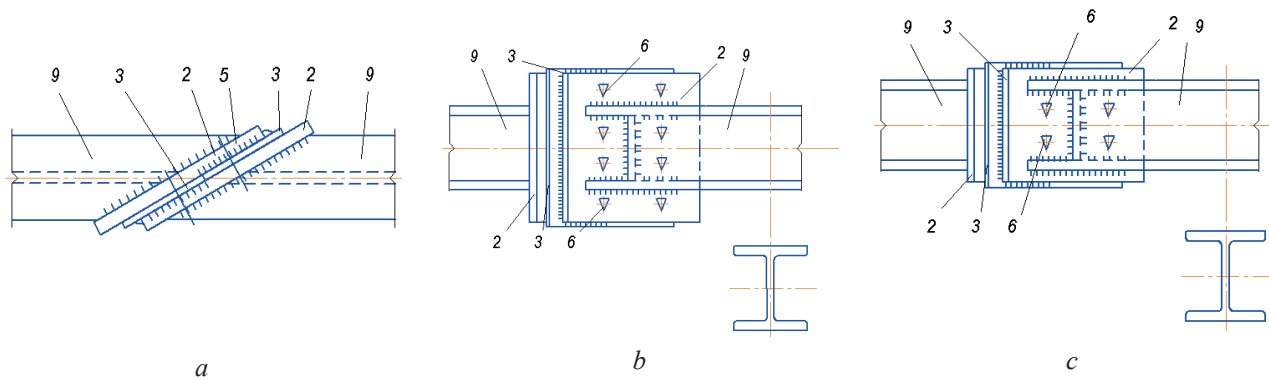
Schemes of flange connections of I-profiles: a - top view; b – side view; c - side view in the absence of bolts in the outer zones of the profile; 2 - oblique flange; 3 - support table; 5 - bolt hole; 6 - coupling bolt; 9 - I-profile
